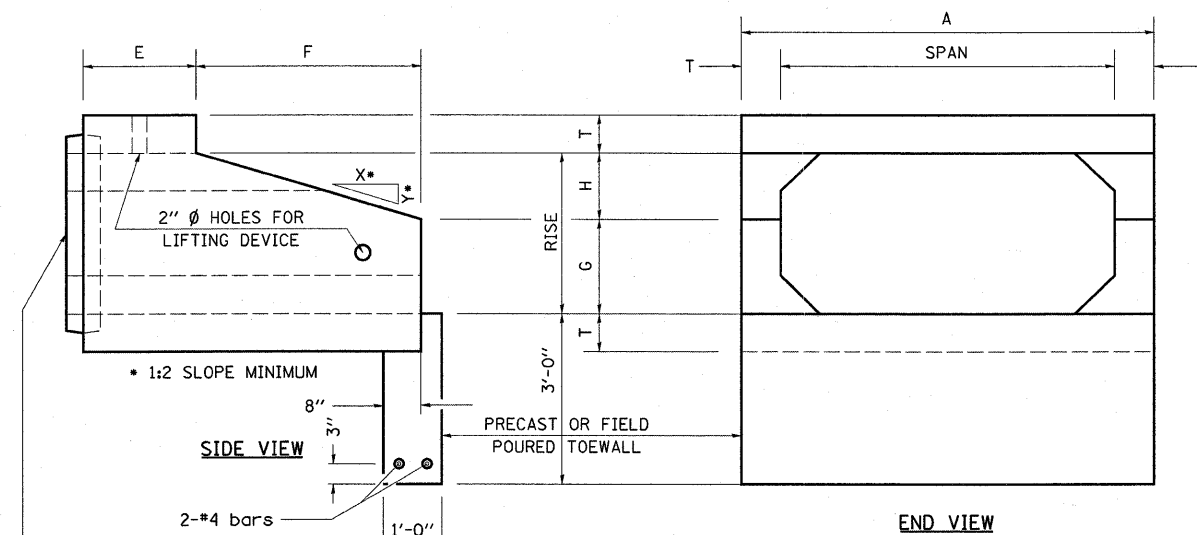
# DETAIL OF PRECAST CONCRETE BOX CULVERT END SECTION
